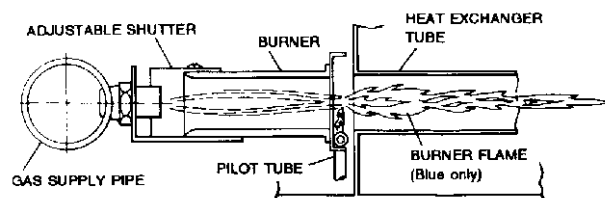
MAIN BURNER, PILOT TUBE, GAS MANIFOLD AND ADJUSTABLE SHUTTERS
